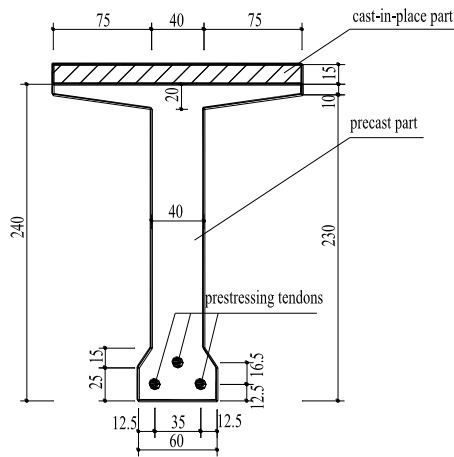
Prestressing tendons in the mid-span section of Girder G3 (units: cm)
